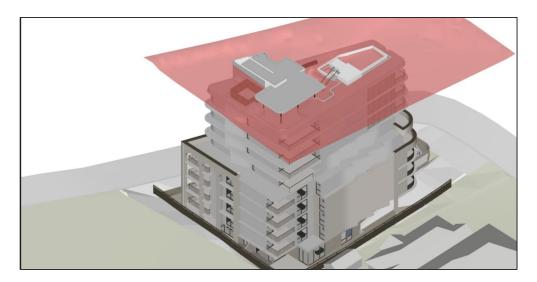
A 3D model of the development as viewed from the east, showing proposed elements that do not comply with the 28.6 metre building height overlay (denoted by the red overlay) Source: PSI Architects, 2025
